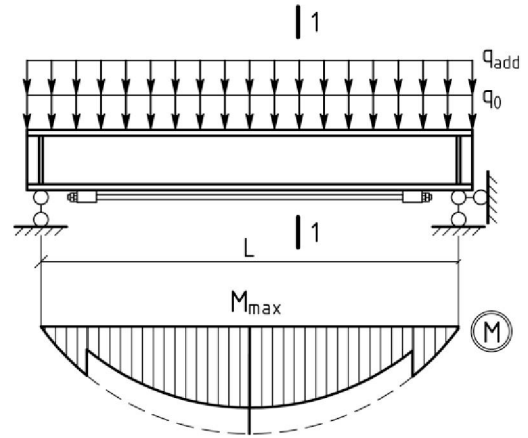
Calculation scheme of a metal beam strengthened under partial loading (q_0 , kN/m) by installing horizontal elements—either reinforcement bars or rolled steel strips—in the tensile zone.
